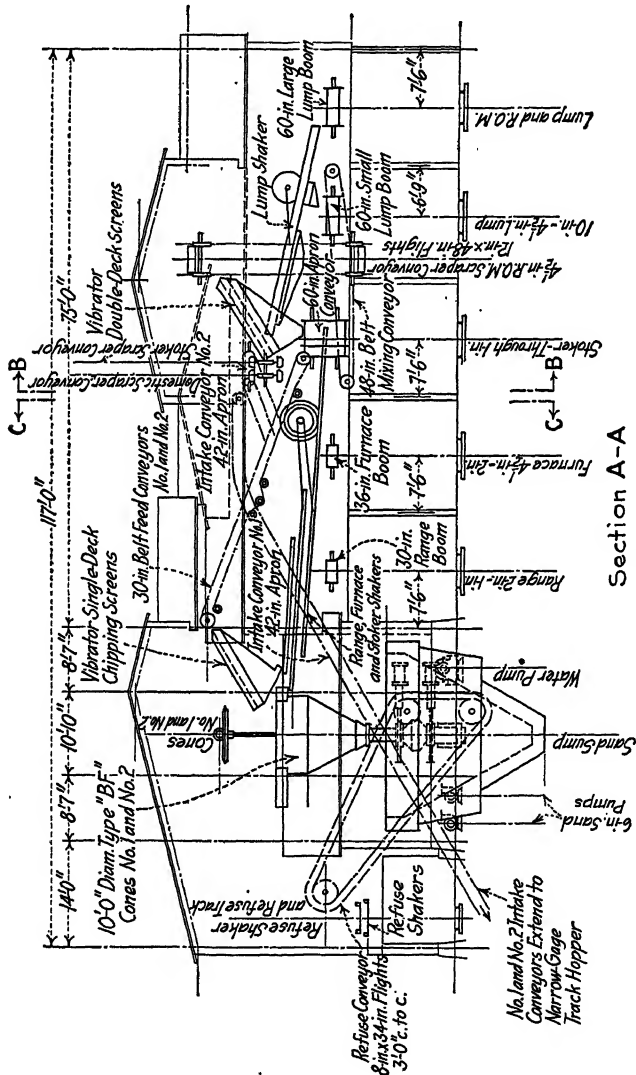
Mt. Union Plant of East Broad Top R. R. & Coal Co. for cleaning bituminous by sand-flotation process. (Section A-A.)
